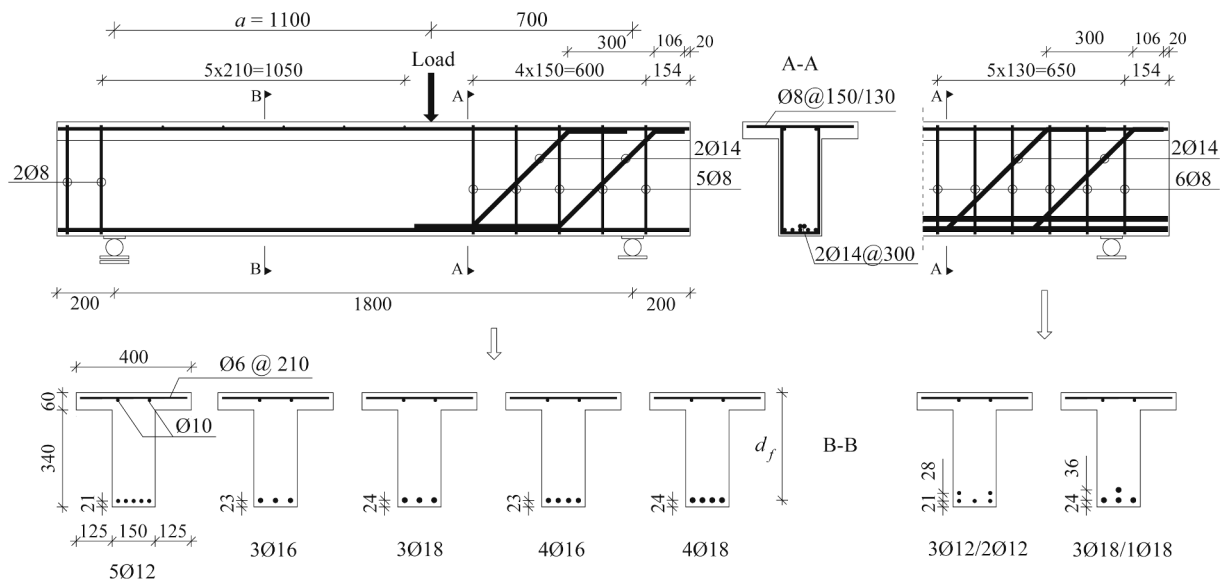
Geometry, reinforcement details, and support and loading conditions of the beams of the test program (dimensions in mm) (adapted from [22]).
